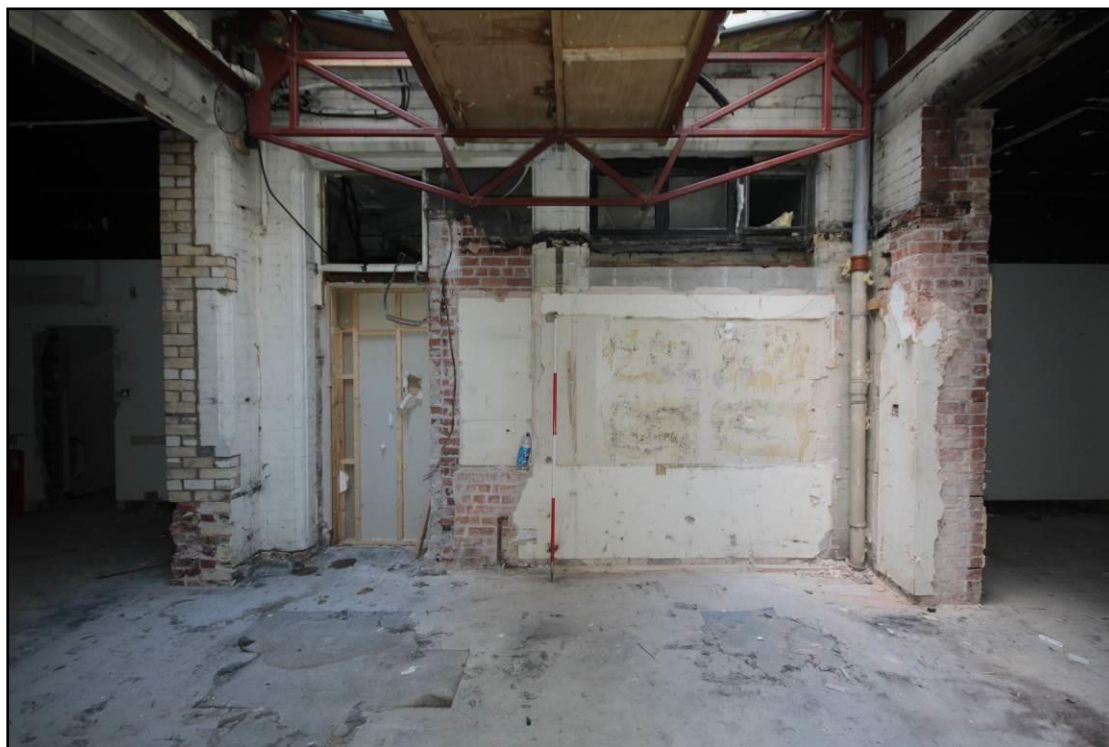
View of the southern wall of GF5's central bay, taken with 2m scale facing south
